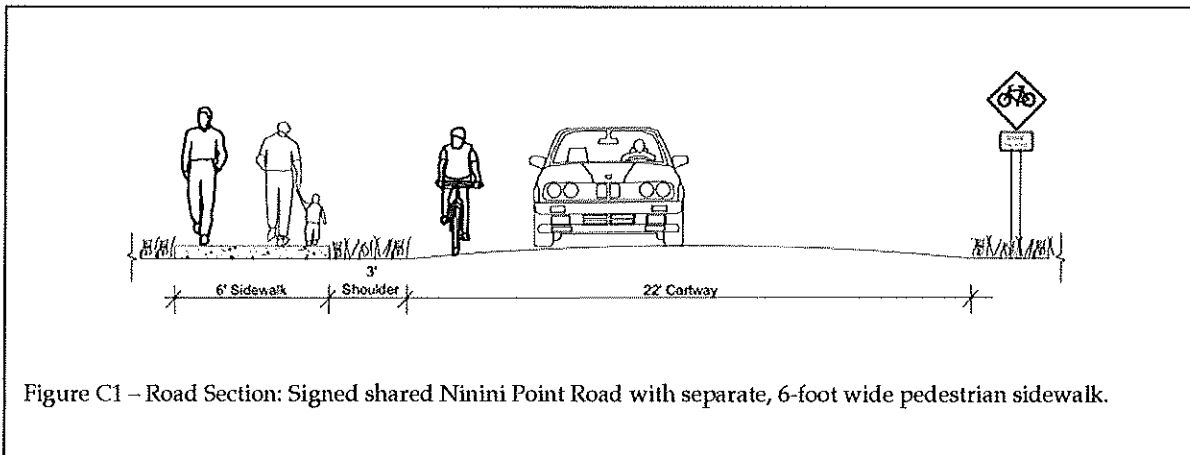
Road Section: Signed shared Ninini Point Road with separate, 6-foot wide pedestrian sidewalk.
